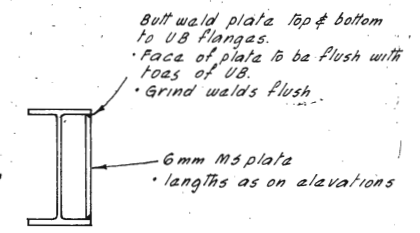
DETAIL OF WELD PLATES ON RAFTERS FRAME 14
